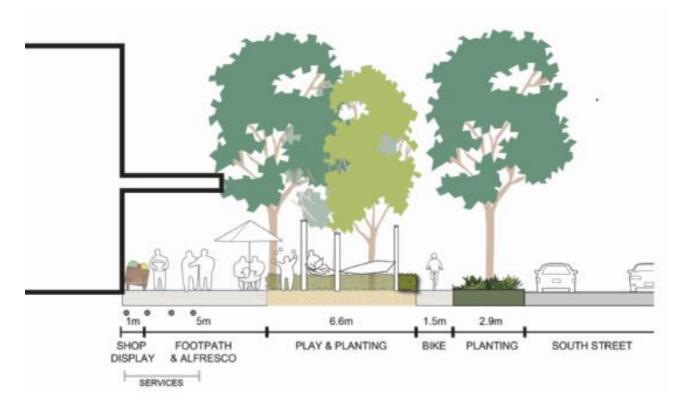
Streetscape Cross Section – South Street (interim without road widening)
